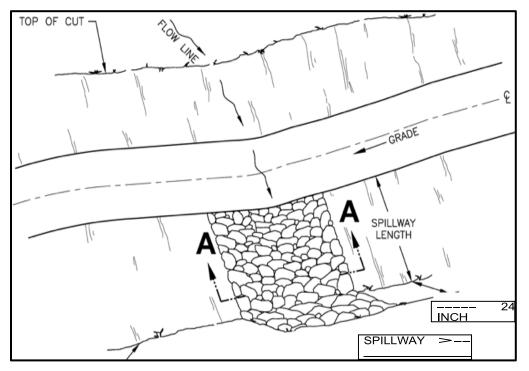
shows a Typical Rock Spillway for a Drainage Dip or Cross Drain.
